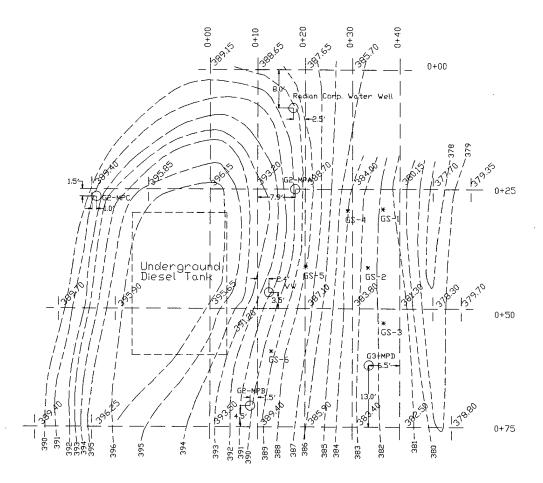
Schematic Diagram of Power Plant Site at Galena AFS (GS - Soil Gas Survey Point; MP - Monitoring Point)
